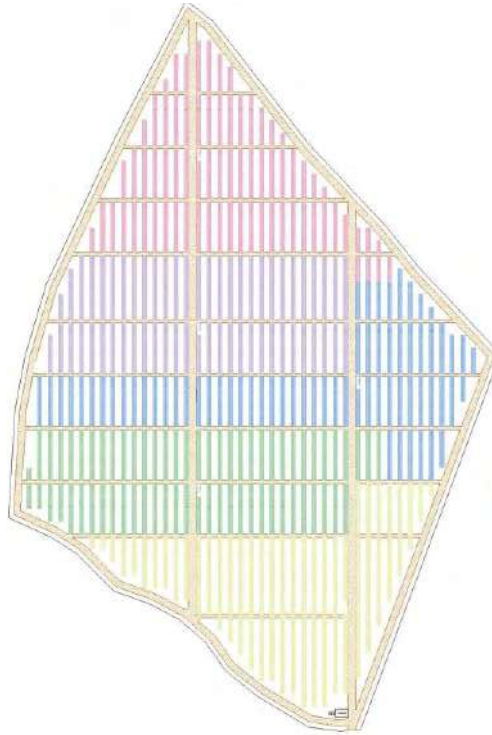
Solar Park layout (Source: Author's own, Compilation: Author's own)
